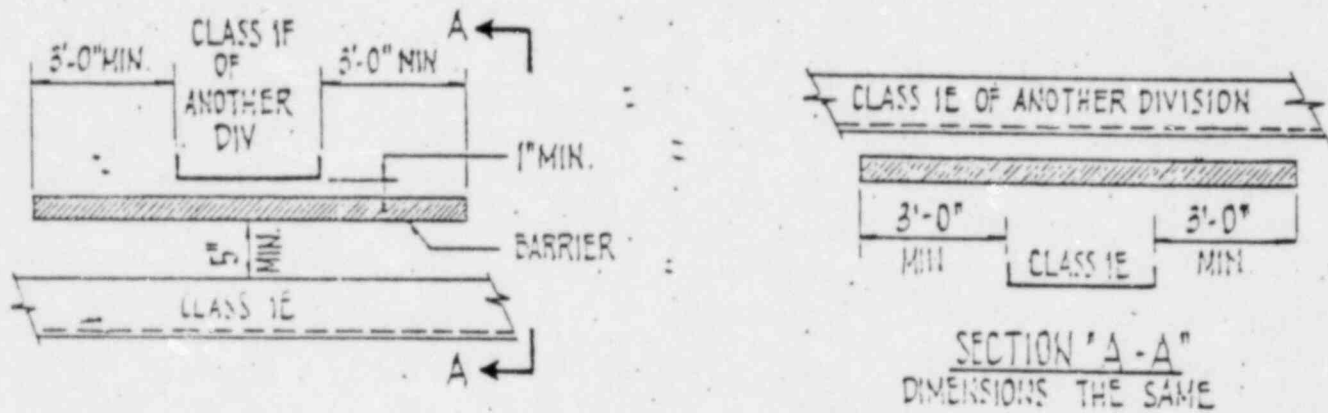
ARRANGEMENT FOR CLASS 1E CABLE TRAY CROSSINGS
